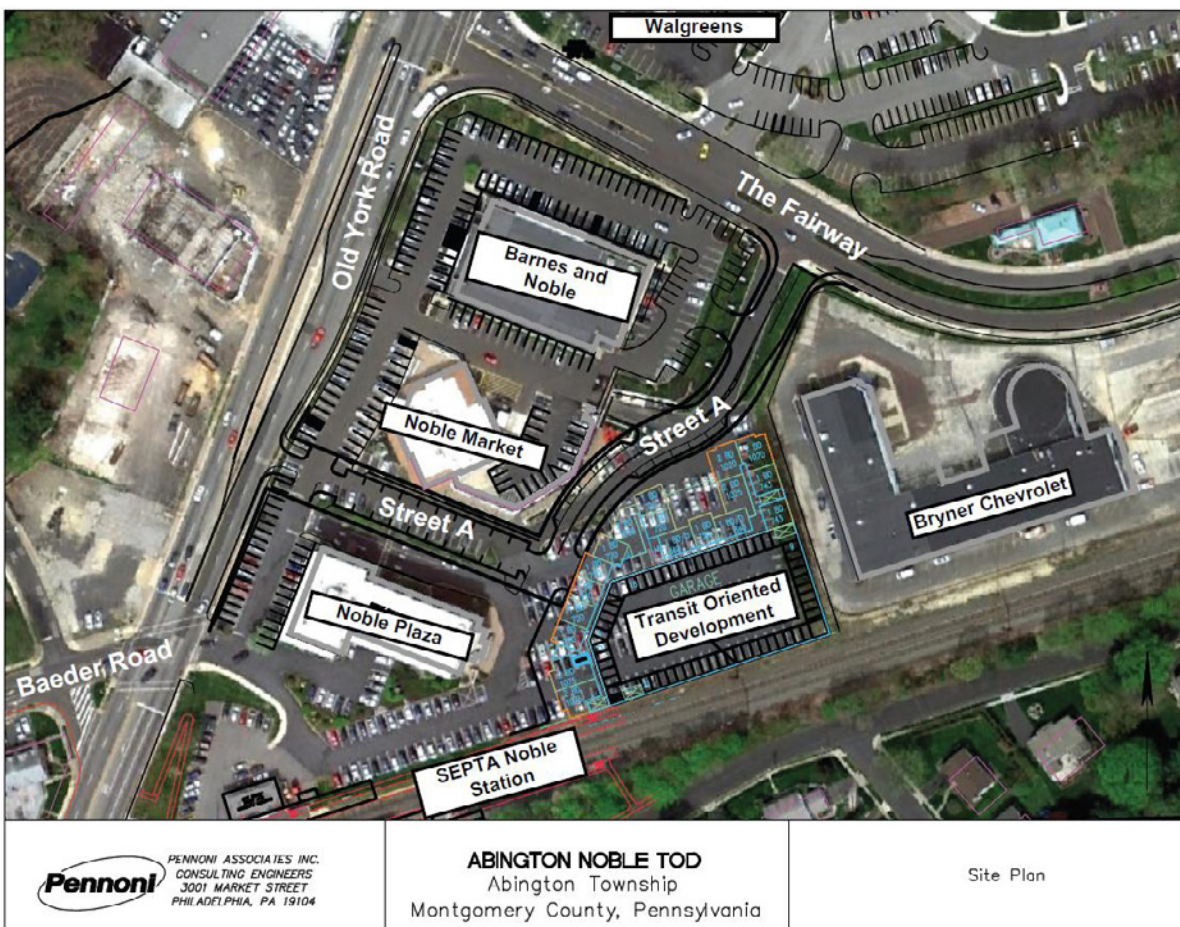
Aerial Photo of Abington Noble Proposed TOD Development.
